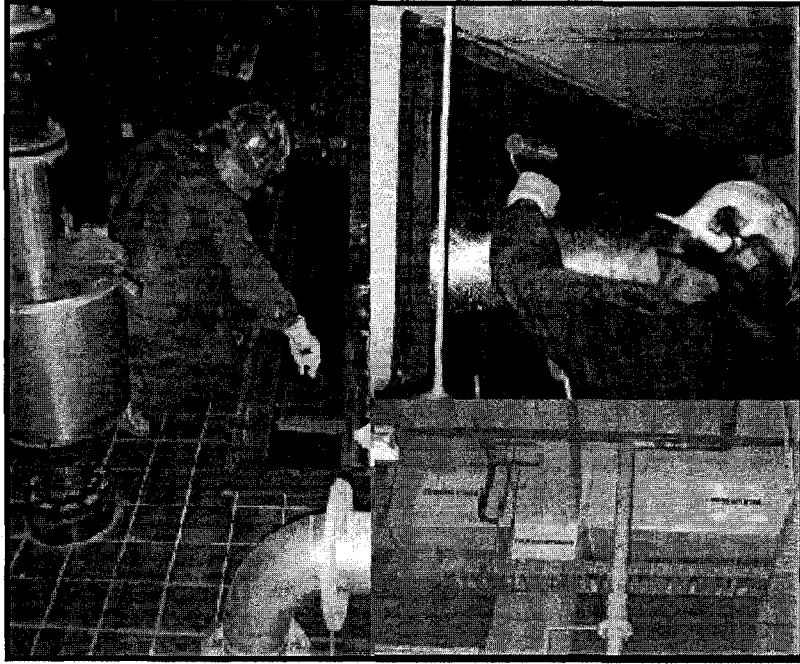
Windsor Dewatering Building (Stanley Consulting Group, 1998)
